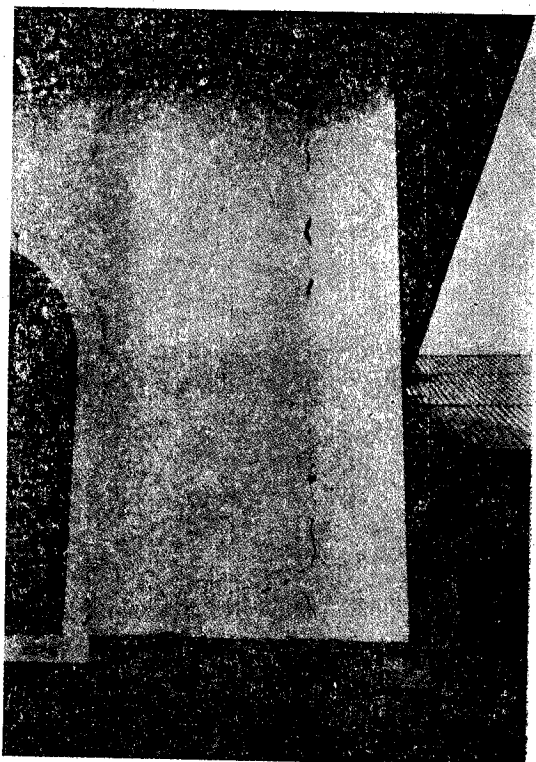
(b)—Cracks along the junction of the front and side wall of the Court Building at Badgam.
